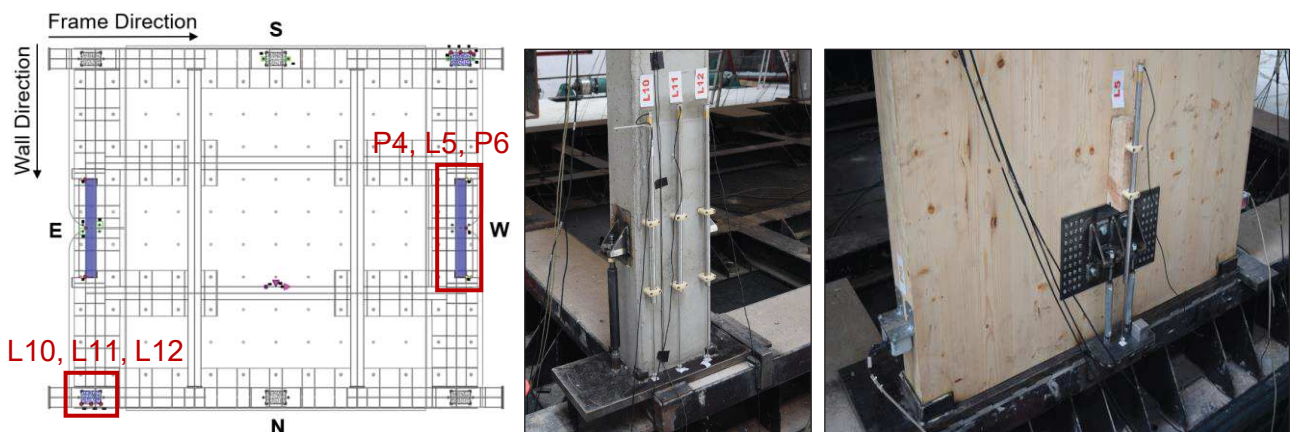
LVDTs and potentiometers on the foundation level: LVDTs of the column in the North-East corner (centre) and LVDT/potentiometers monitoring the West wall.
